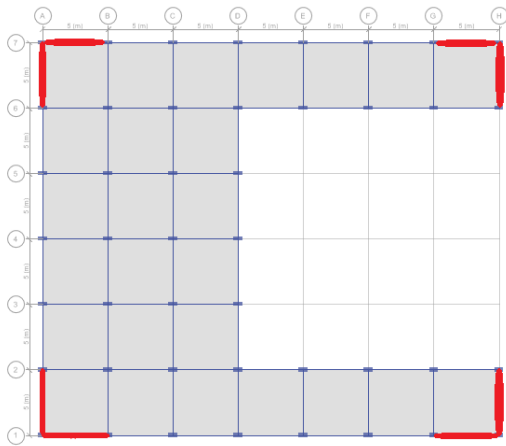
Plan of Model 6 (bracing locations are marked with red line)
